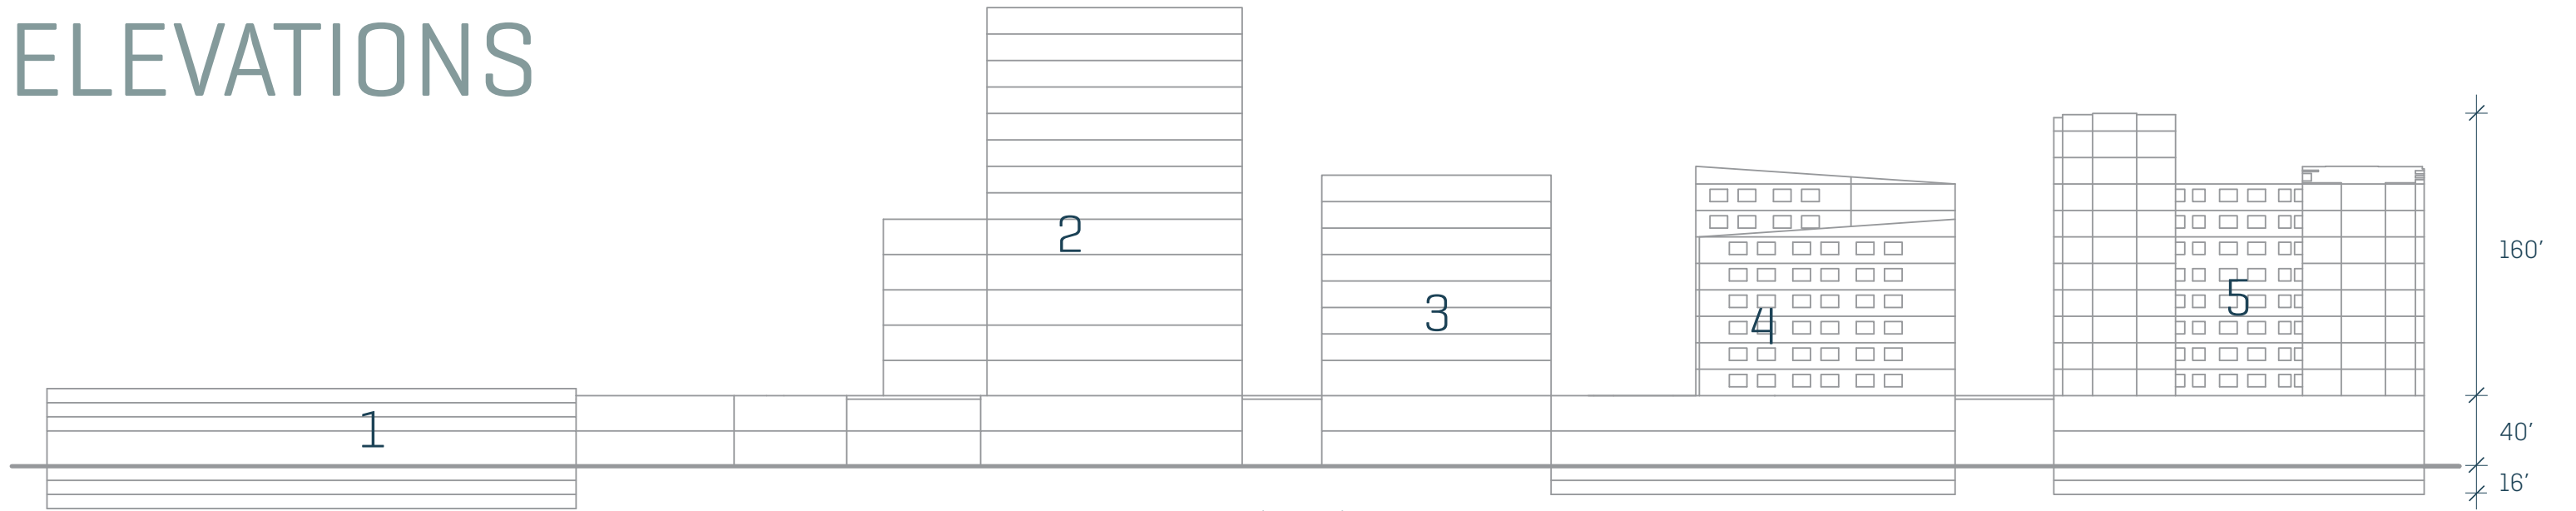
Chandler Boulevard (westbound) toward north
